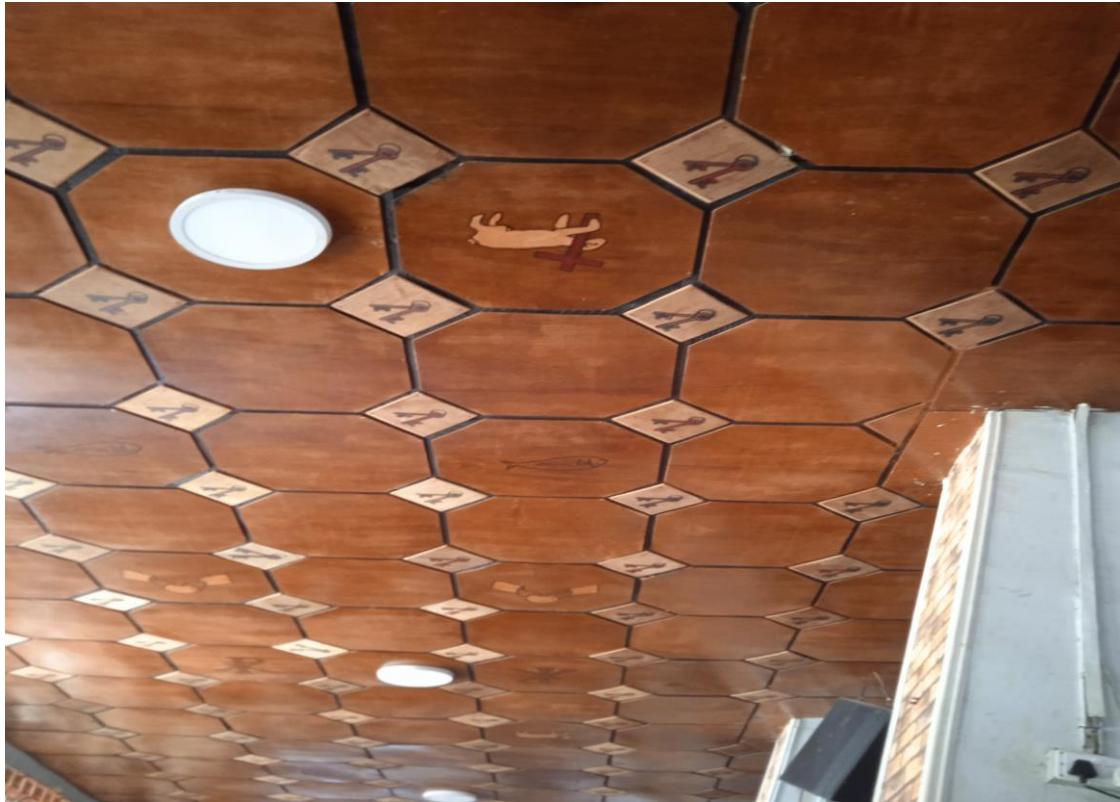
Timber Ceiling with Neatly Installed Light Fittings
